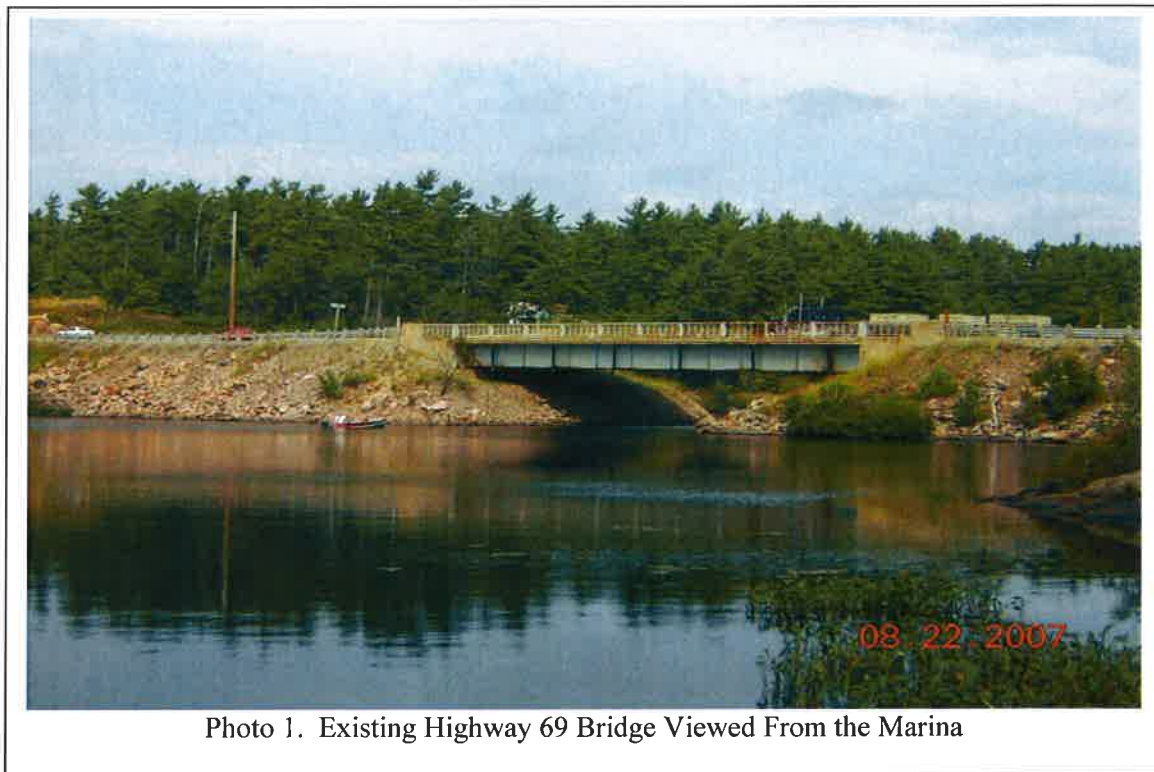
Existing Highway 69 Bridge Viewed From the Marina
